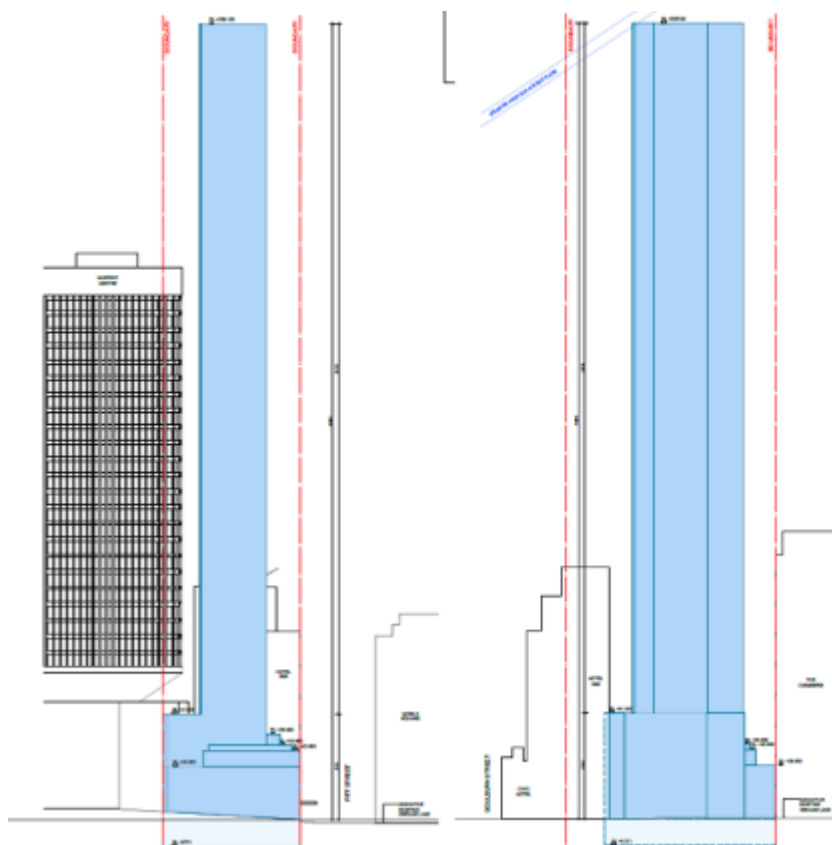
Proposed envelope plans - north (left) and east (right) elevations
